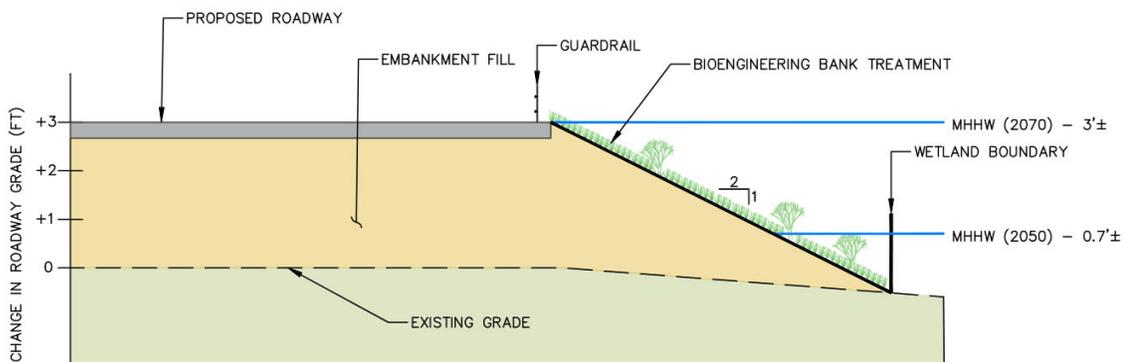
Representative cross section of Alternative 1: Raising the Road to Elevation 7.0
